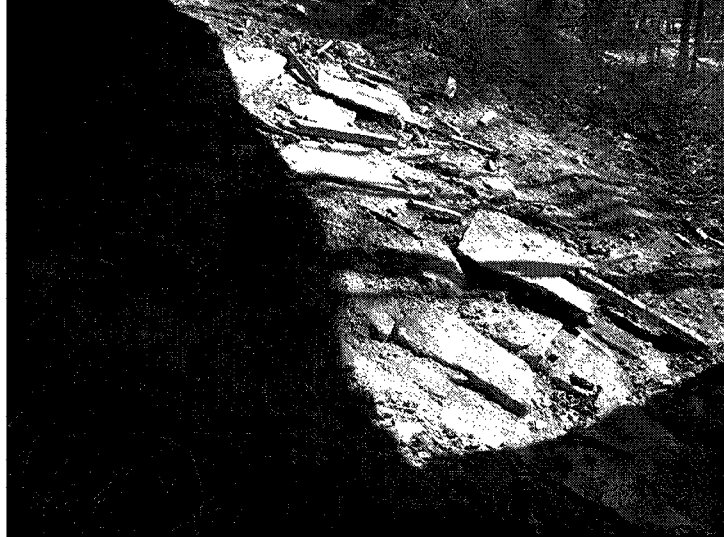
Several of the timber repair forms have fallen to the embankment below Span 3.
